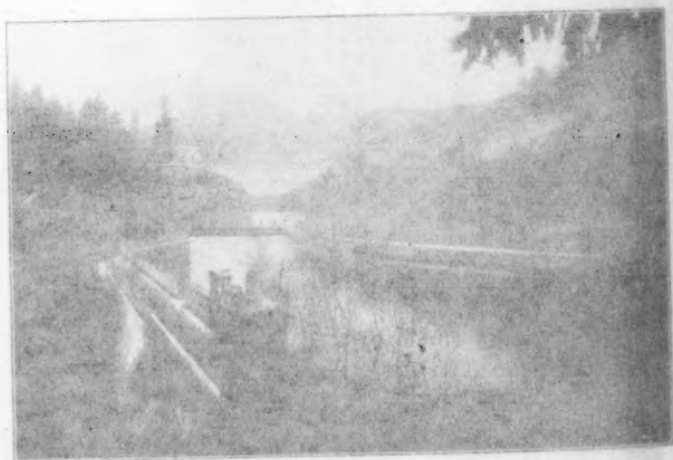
RESERVOIR NO. 1 SINCE REPAIRS WERE COMPLETED IN 1904.
